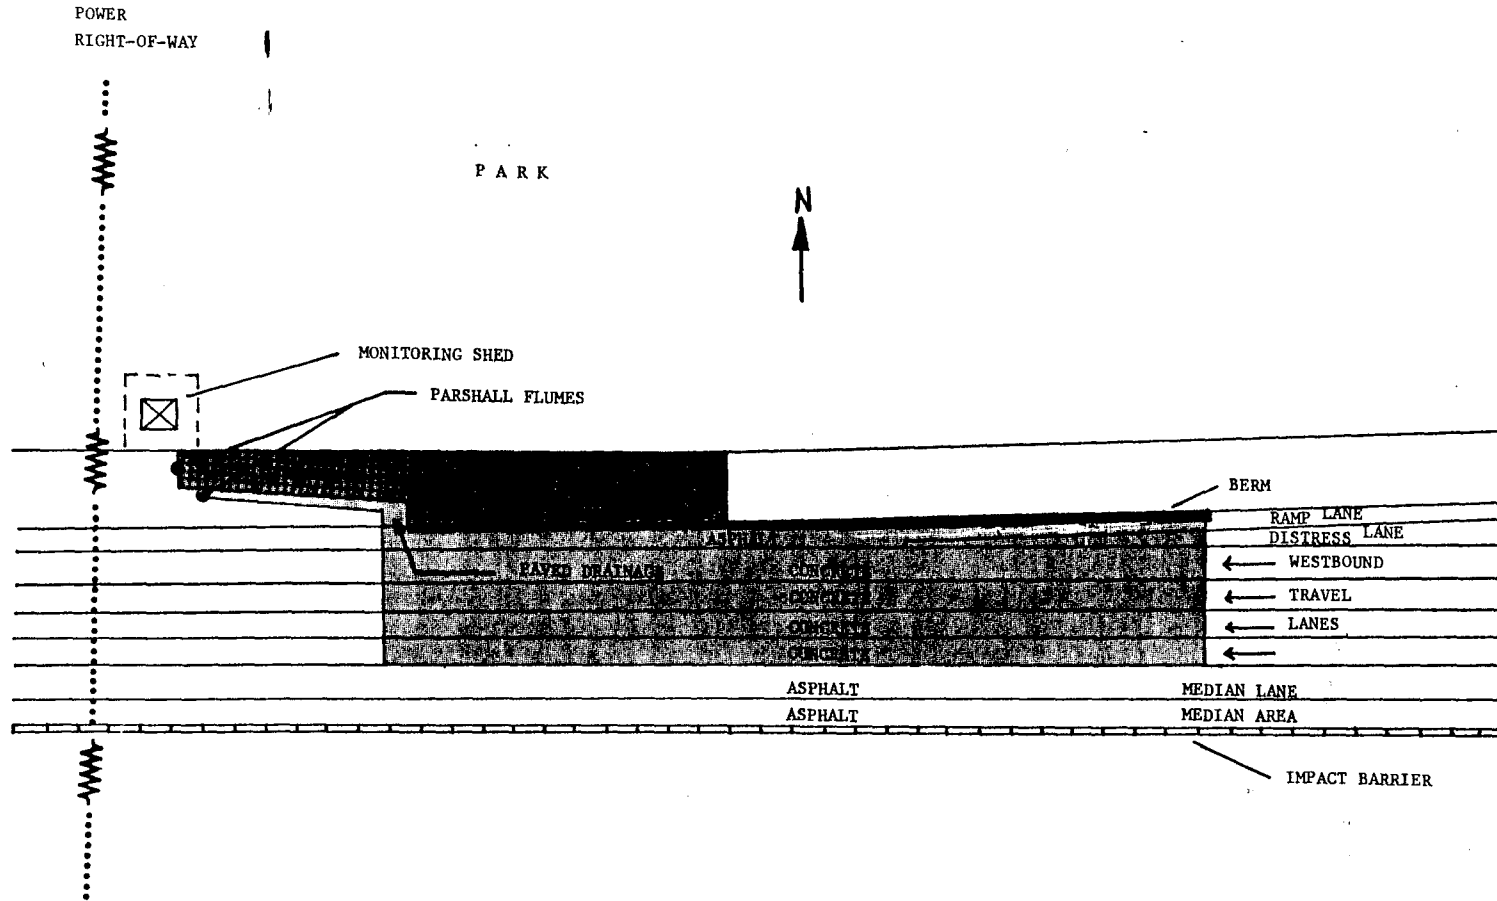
Schematic drainage plan - Sacramento Hwy 50 site.
